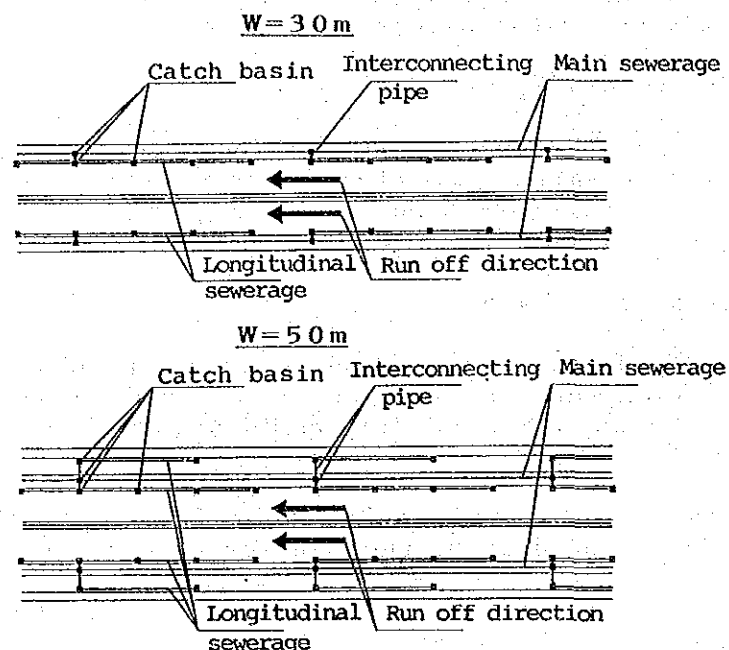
TYPICAL PLAN OF ROAD DRAINAGE SYSTEM
